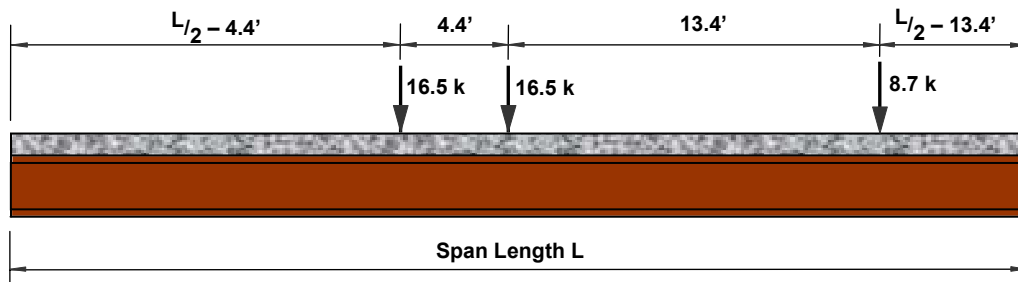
Plan view of Stalling bridges showing longitudinal dimensions and loading for two truck tests
